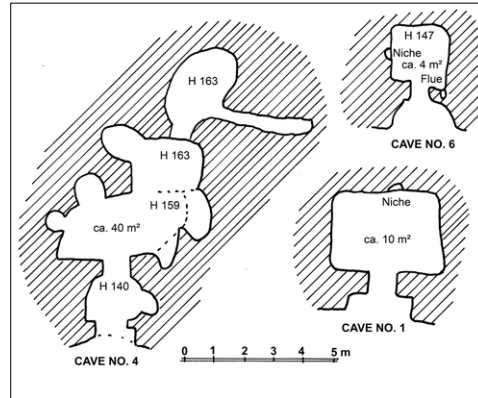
Yılanlıin Kayası, sketch plan of the cave house
